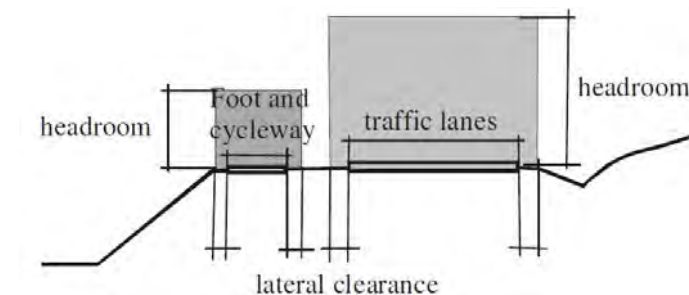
Typical Cross Section of New Baneshwor Underpass
